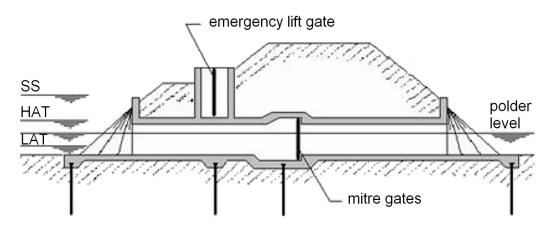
Cross-section of a culvert-type dewatering sluice (infra-wiki.nl)
